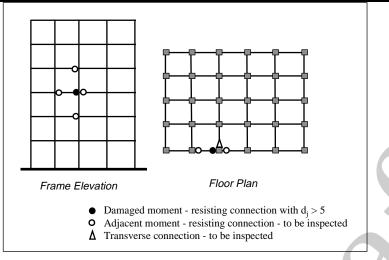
Inspection of Connections Adjacent to Damaged Connection  $(d_j \geq 5)$
